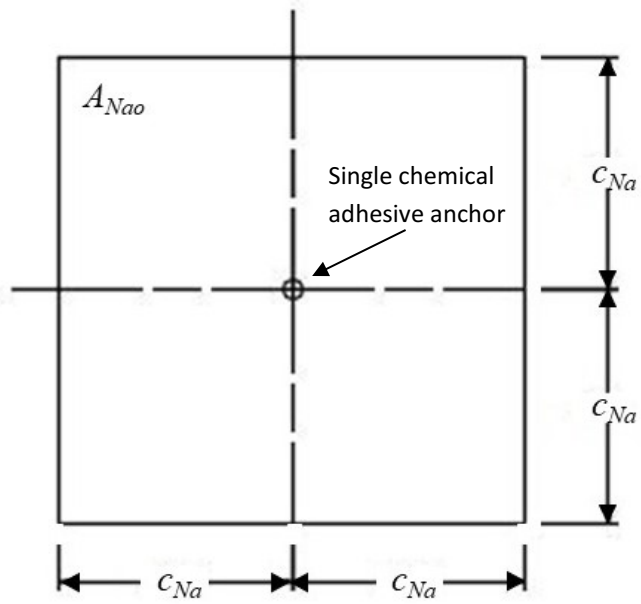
Geometry of a single chemical adhesive anchor away from any concrete edges
